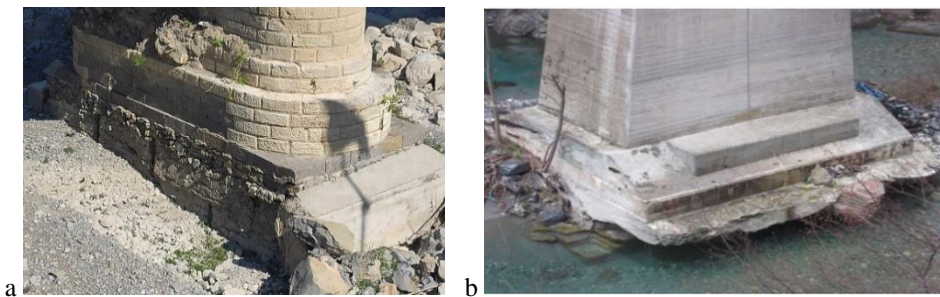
Examples of erosion in piers of bridges and viaducts in similar conditions. In (a) left side of pier's foundation with evident erosion; In (b) view of the foundation of the pier within the riverbed, where particularly severe erosion occurred.
